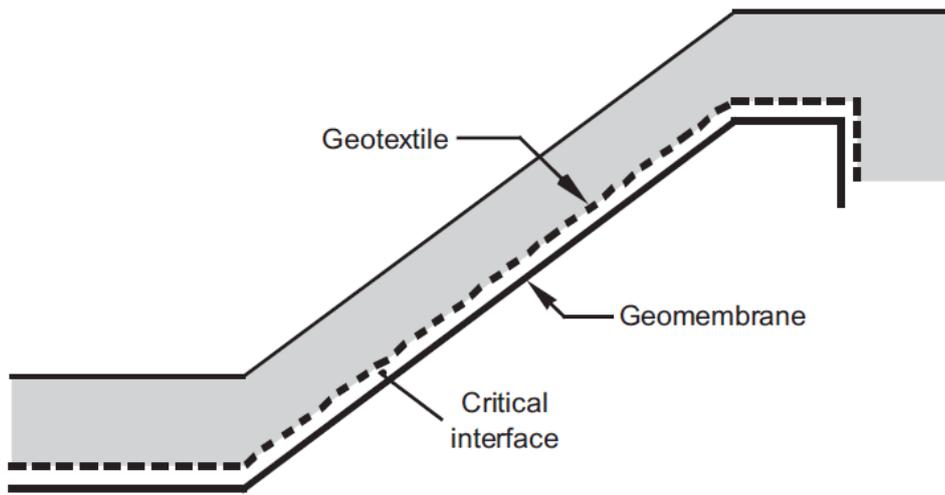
Veneer reinforcement with geotextile on a geomembrane (Koerner and Soong, 2005)
